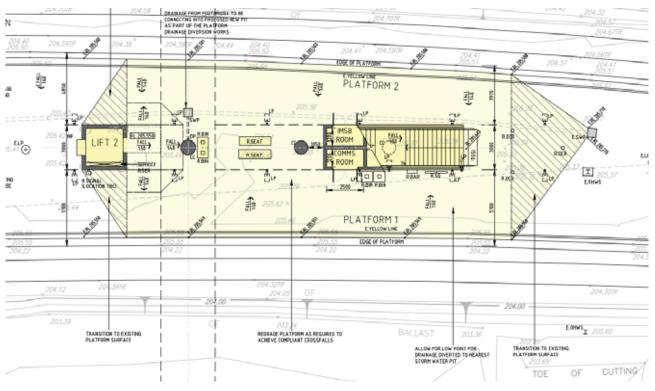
Proposed Platform Drainage Adjustments and Regrading Works
